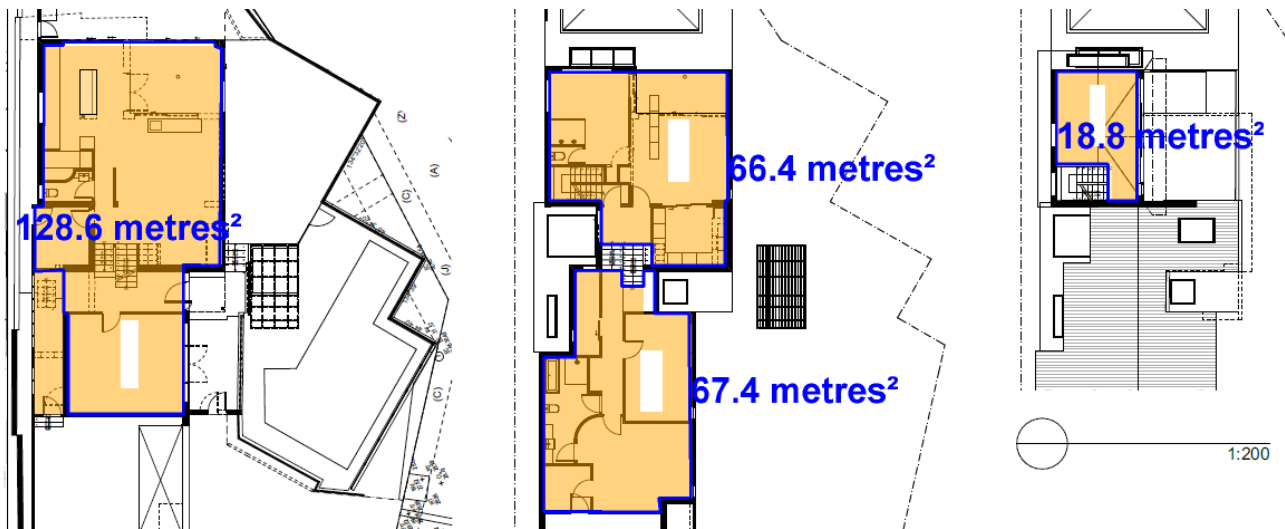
Gross Floor Area Calculation. (Source: Council Planner Assessment on Trapeze)
